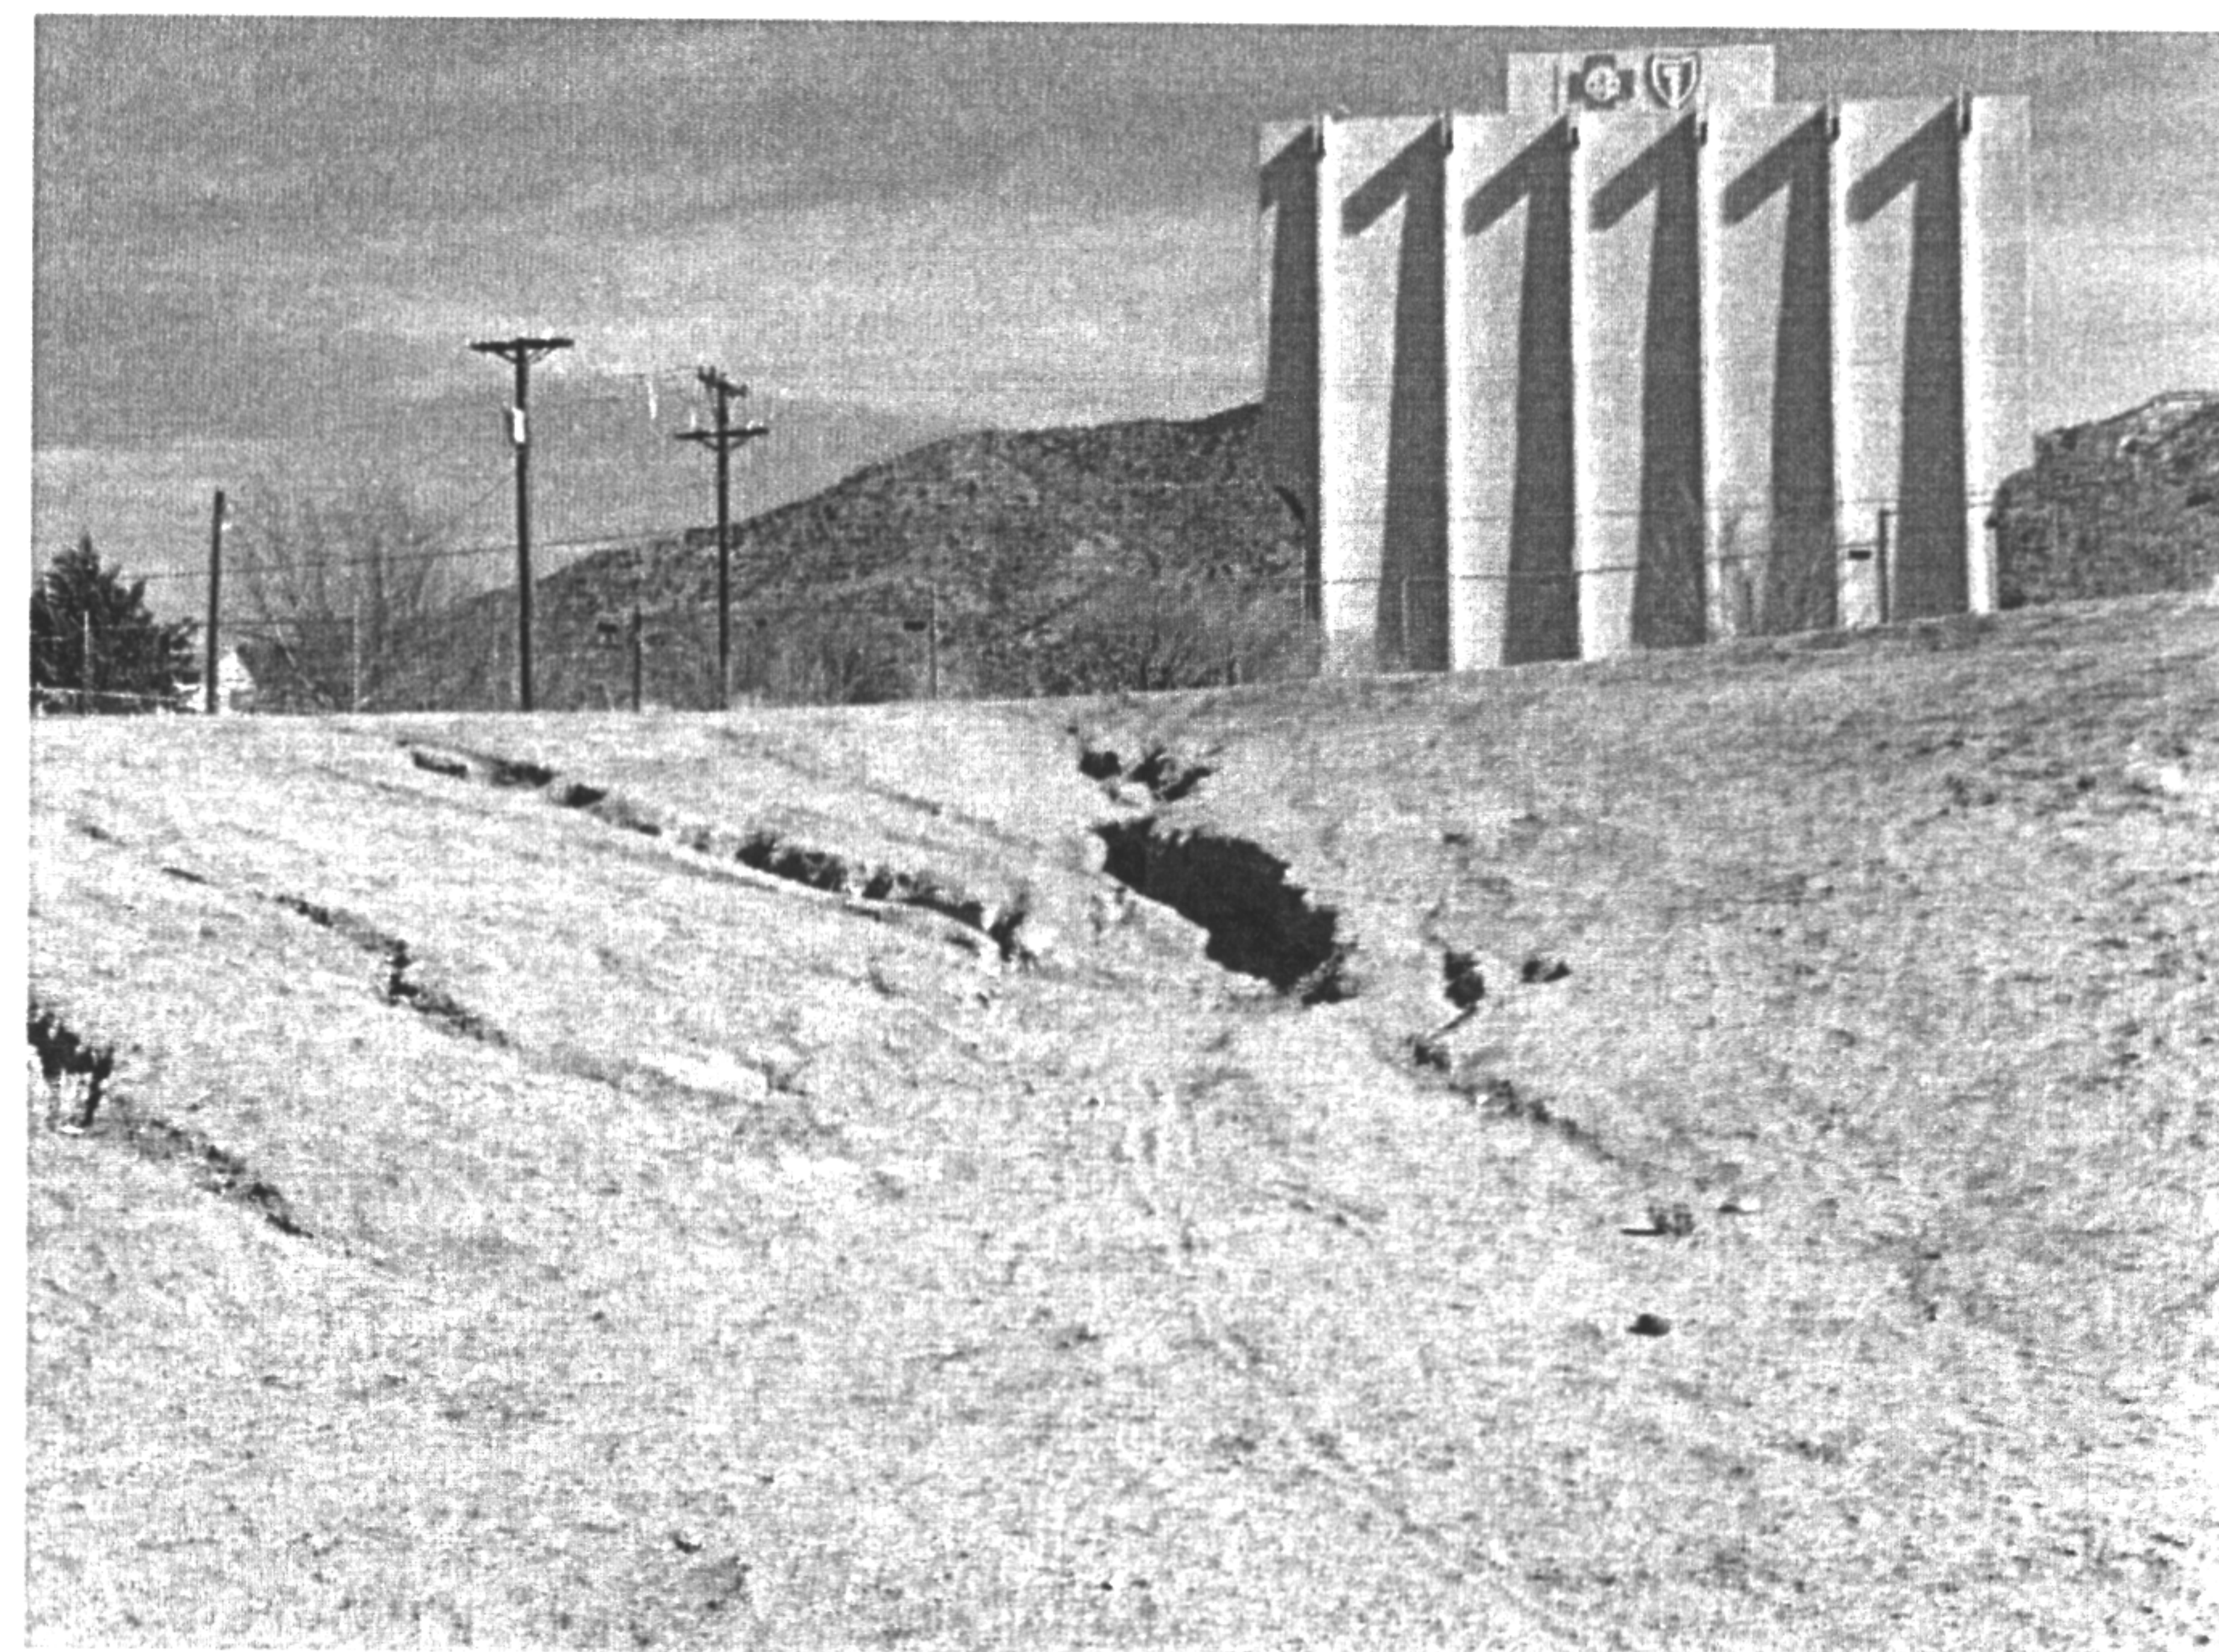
Erosion Along Cut Slope Along East Side of Playground
